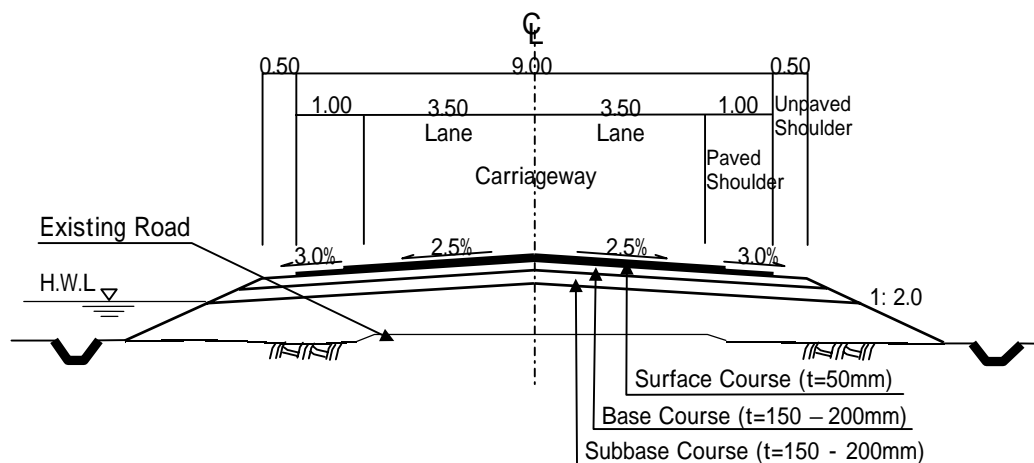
Typical Cross Section for Rural Section (Flat Area)
